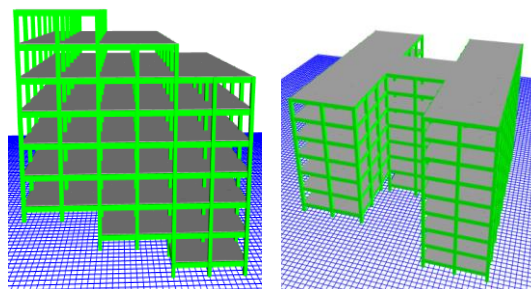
Elevation of H Shape Structure & Step Back Set Back Structure
